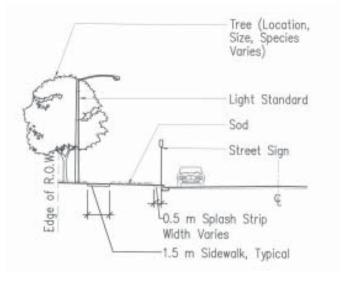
b - Existing Road Edge Condition 5 Sod Strip Between Sidewalk & Splash Strip
